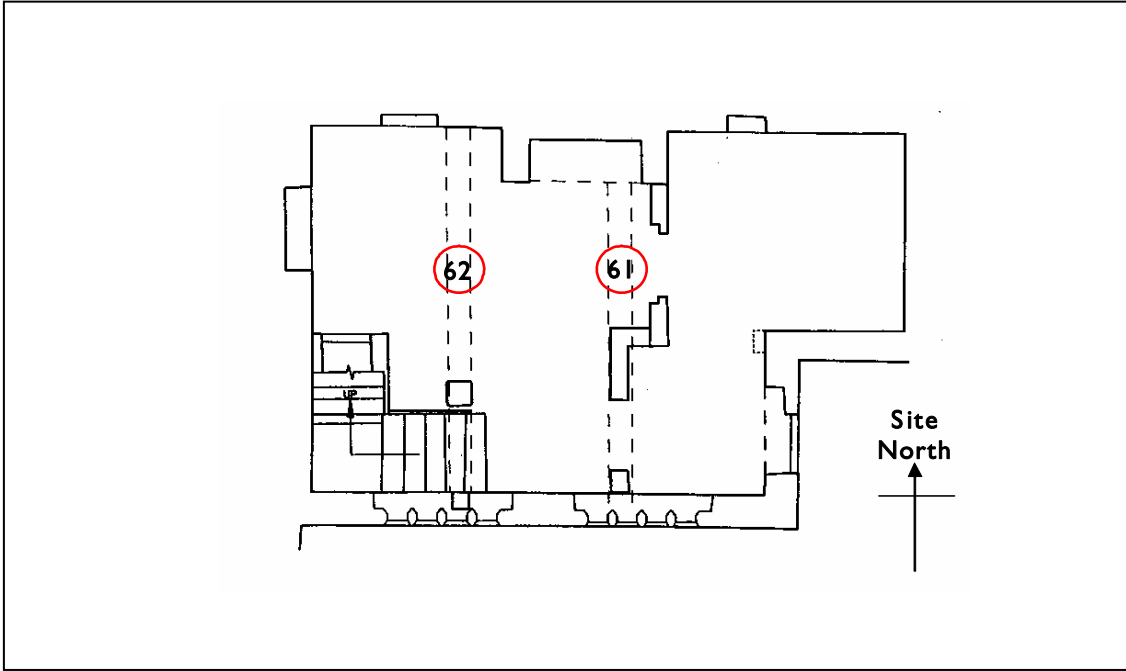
Plan of the basement to show sampled timbers (after Birmingham Archaeology)
